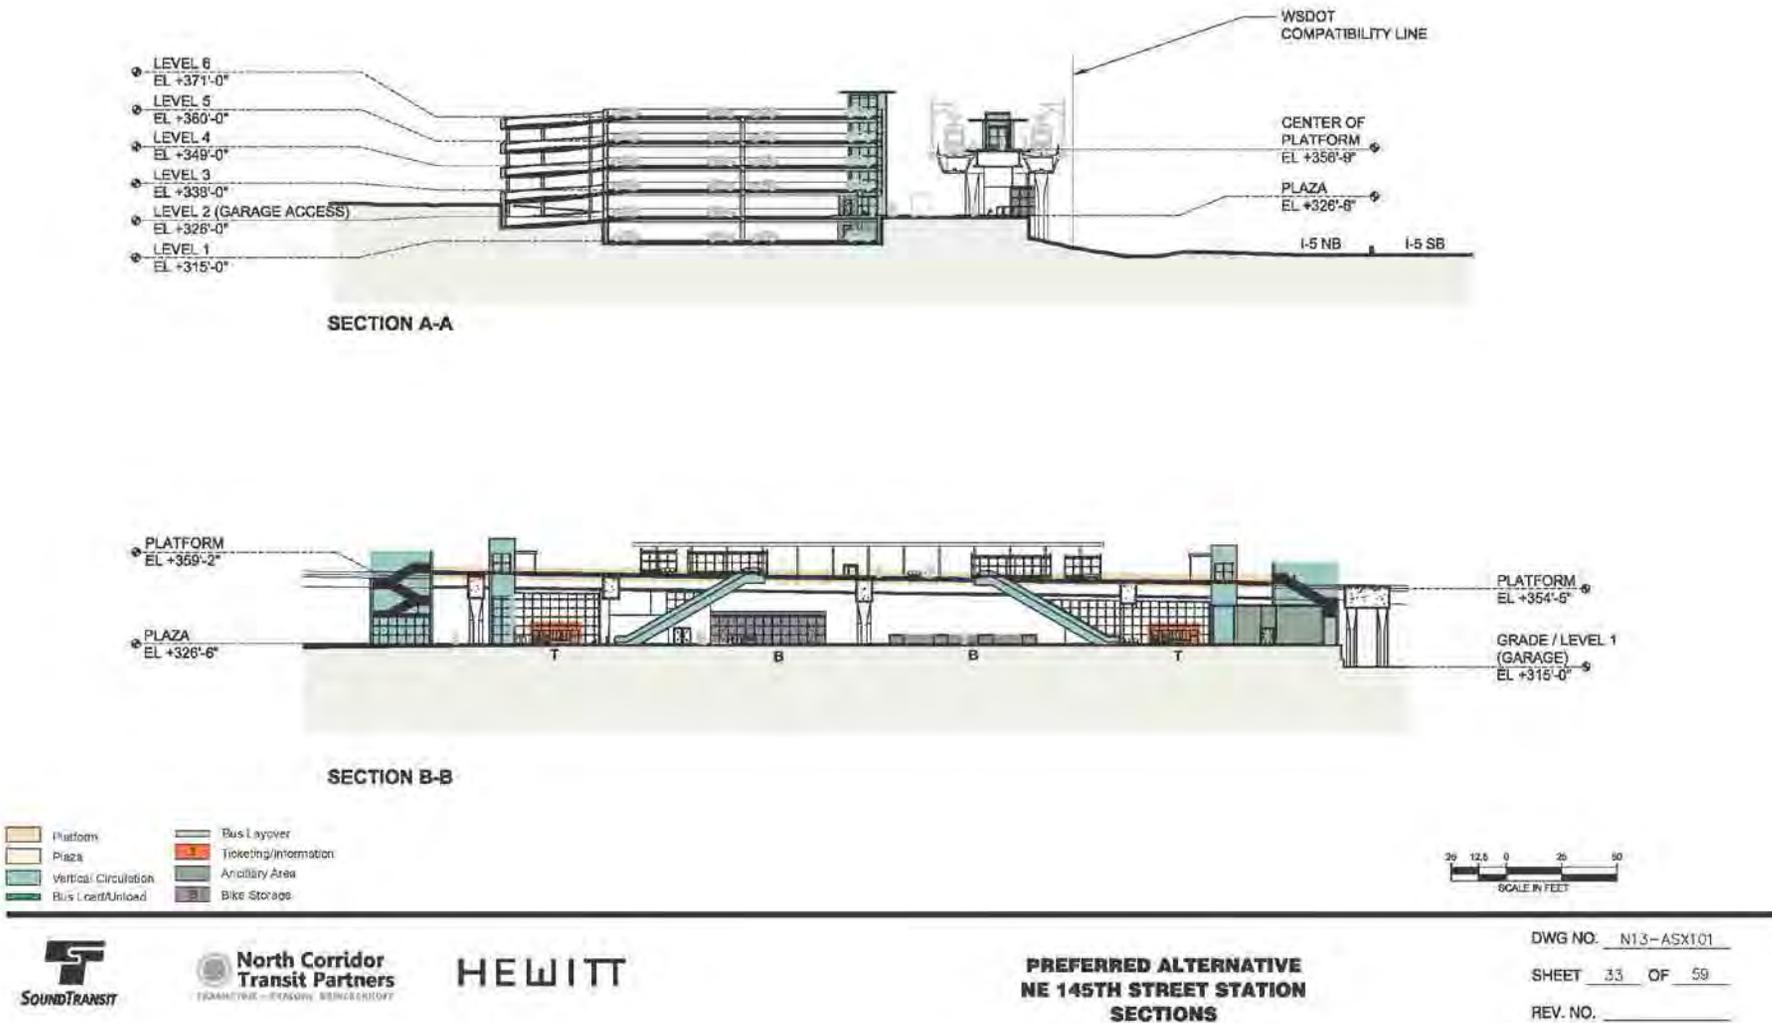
Sound Transit’s Preferred Alternative Conceptual Design Plans for the 145th Street Station
